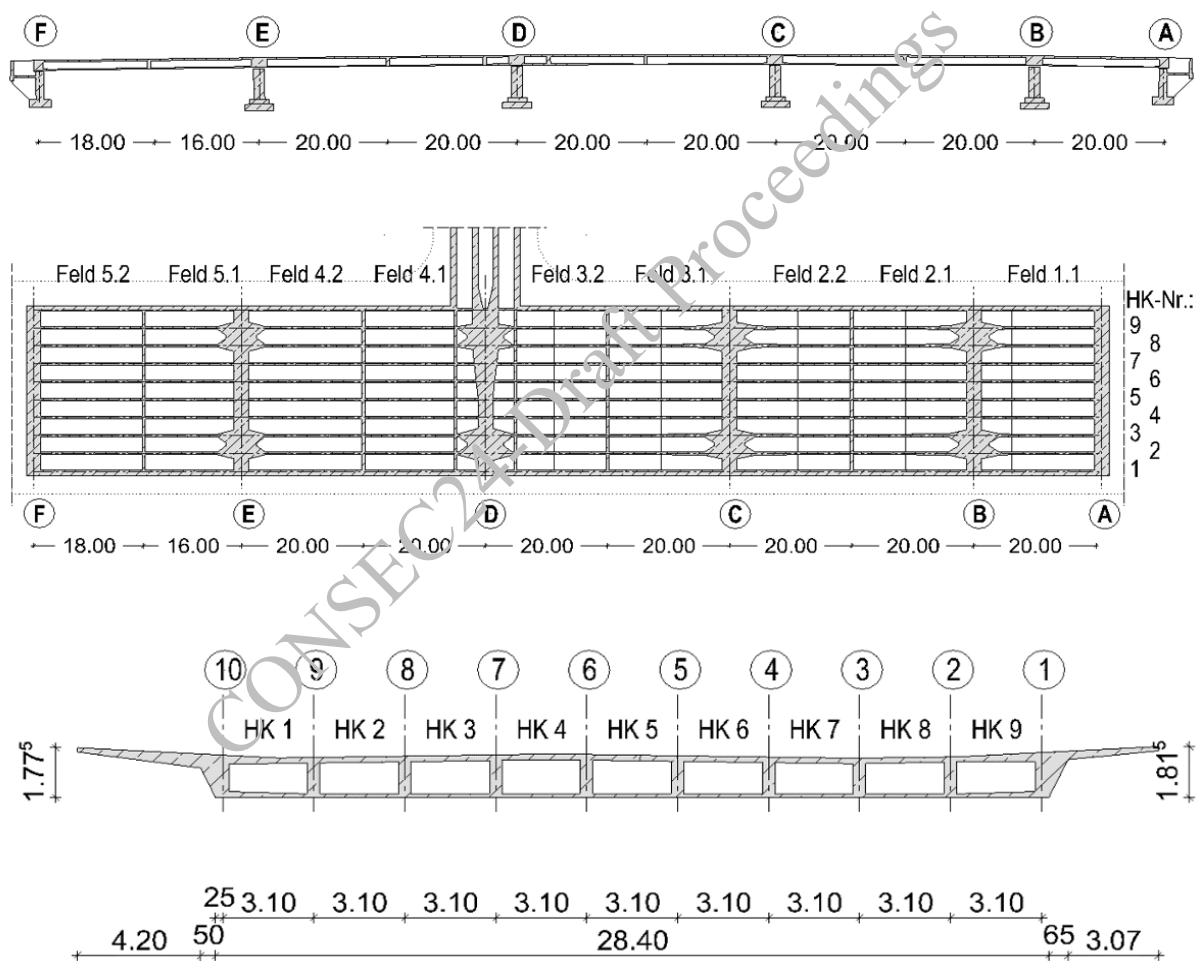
Main supporting structure, longitudinal section, cross-section [Kaplan (2021)]
